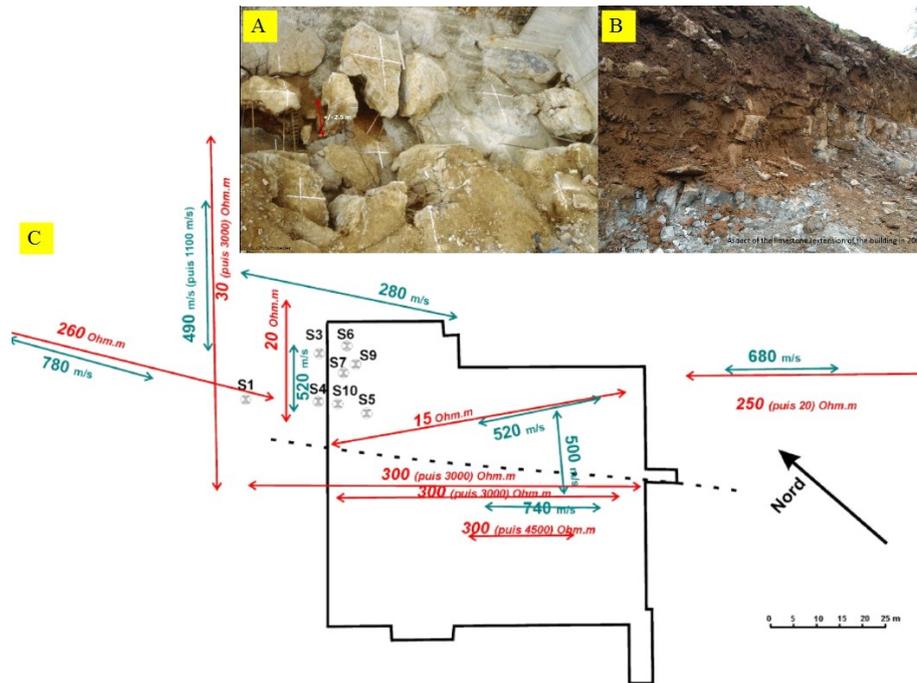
A: Appearance of the bedrock after removal of the “superficial” soft clay cover. The limestone, resembles a decayed tooth instead of constituting a sound, bedrock. The smallest floating blocks were removed and the largest blocks remained in place. The ladder provides a relative scale. The crosses indicate the position of the load bearing columns in the original foundation design. B: The irregular surface of the top of the bedrock can be observed, in the excavations made for the foundation for an extension to the building in 2004. C: A geophysical survey confirmed the existence of two zones: in the west sound limestone (very high electric resistivity); in the north-east presence of clay (low resistivity).
